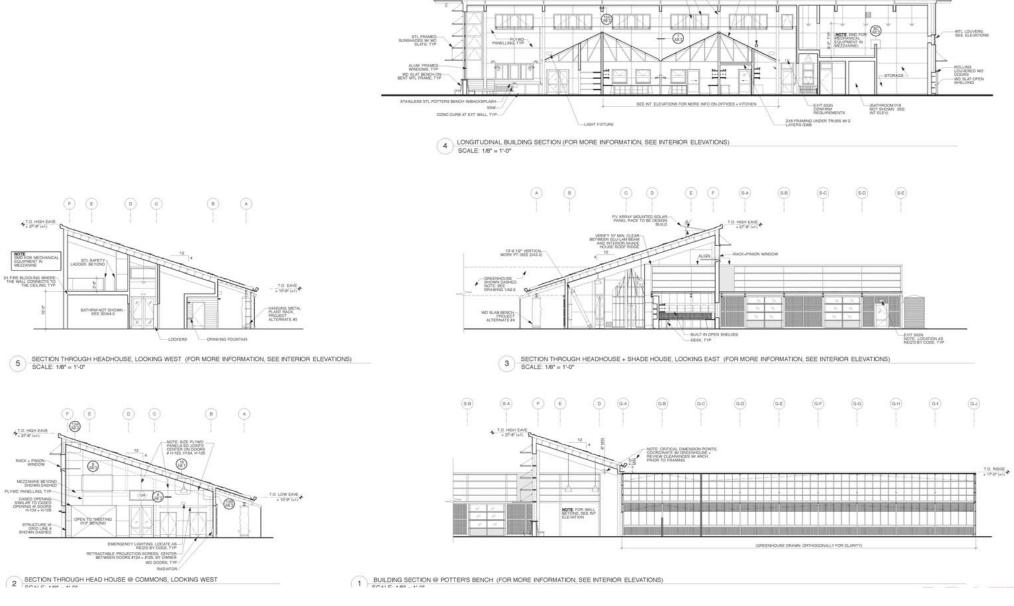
Proposed Nursery: Center for Sustainable Gardening Elevations
